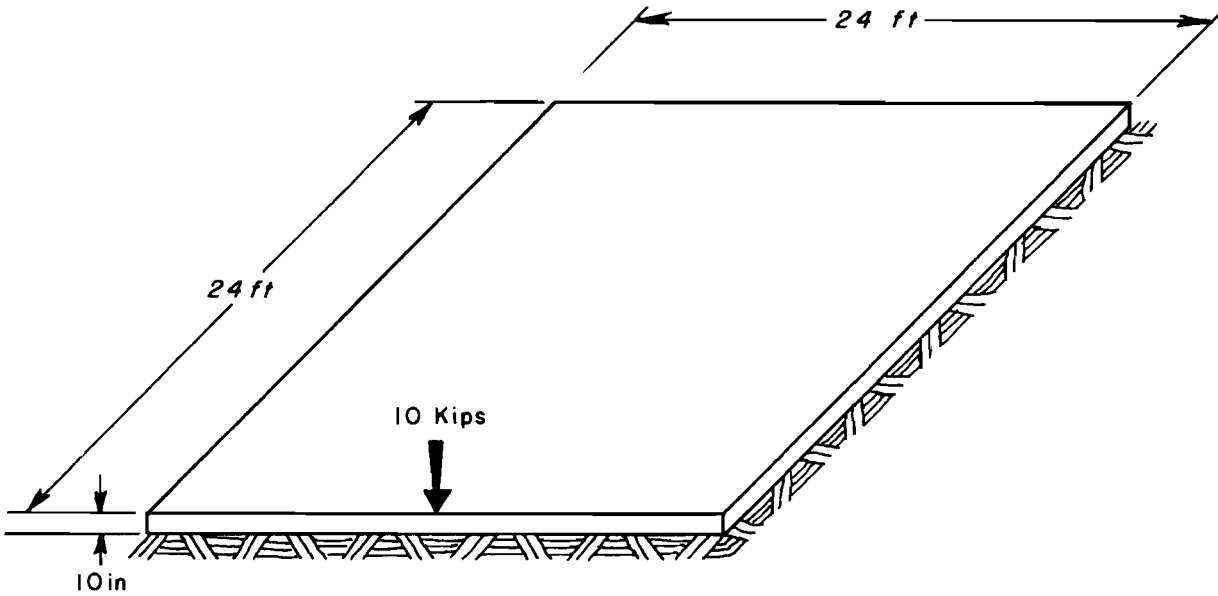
Pavement slab subjected to 10-kip load at the edge with uniform subgrade support.
